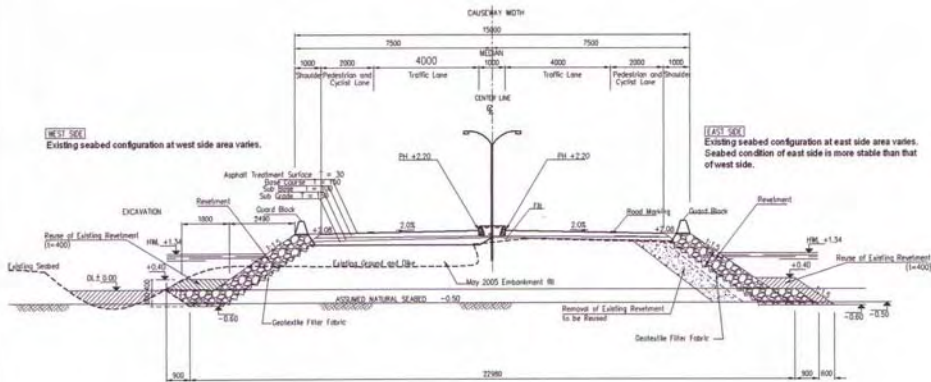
Typical Cross Section of Causeway No.1
